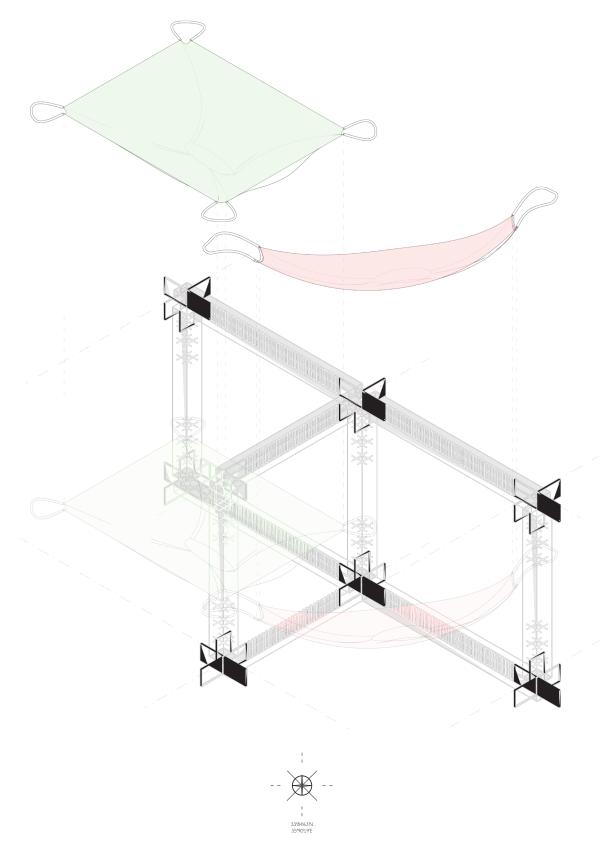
The full set of drawings included detailed shop drawings to be used by the carpenters. These drawings were further developed after a mock up was constructed.
